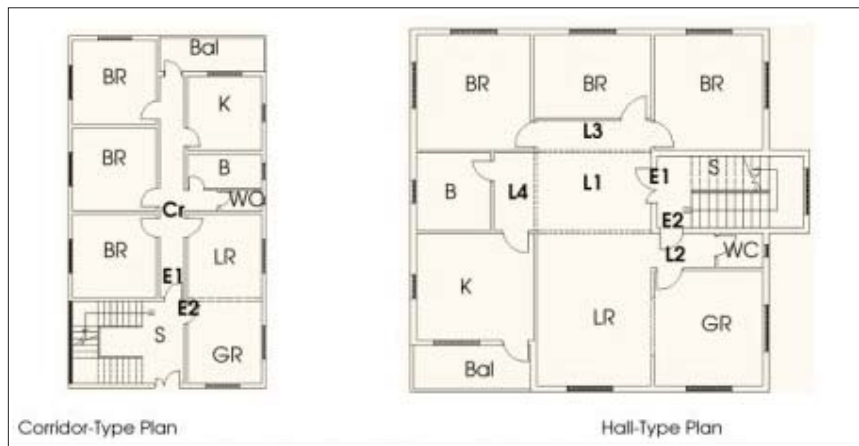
Shows the two common types, type one: "Corridor-Type Plan" and type two: "Hall-Type Plan" (Source: Authors).
